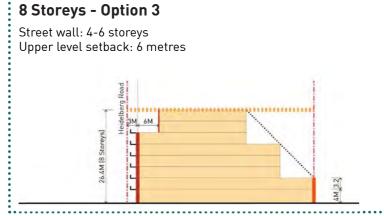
Testing of 8 storey developments with varied street wall heights and upper level street setbacks.
